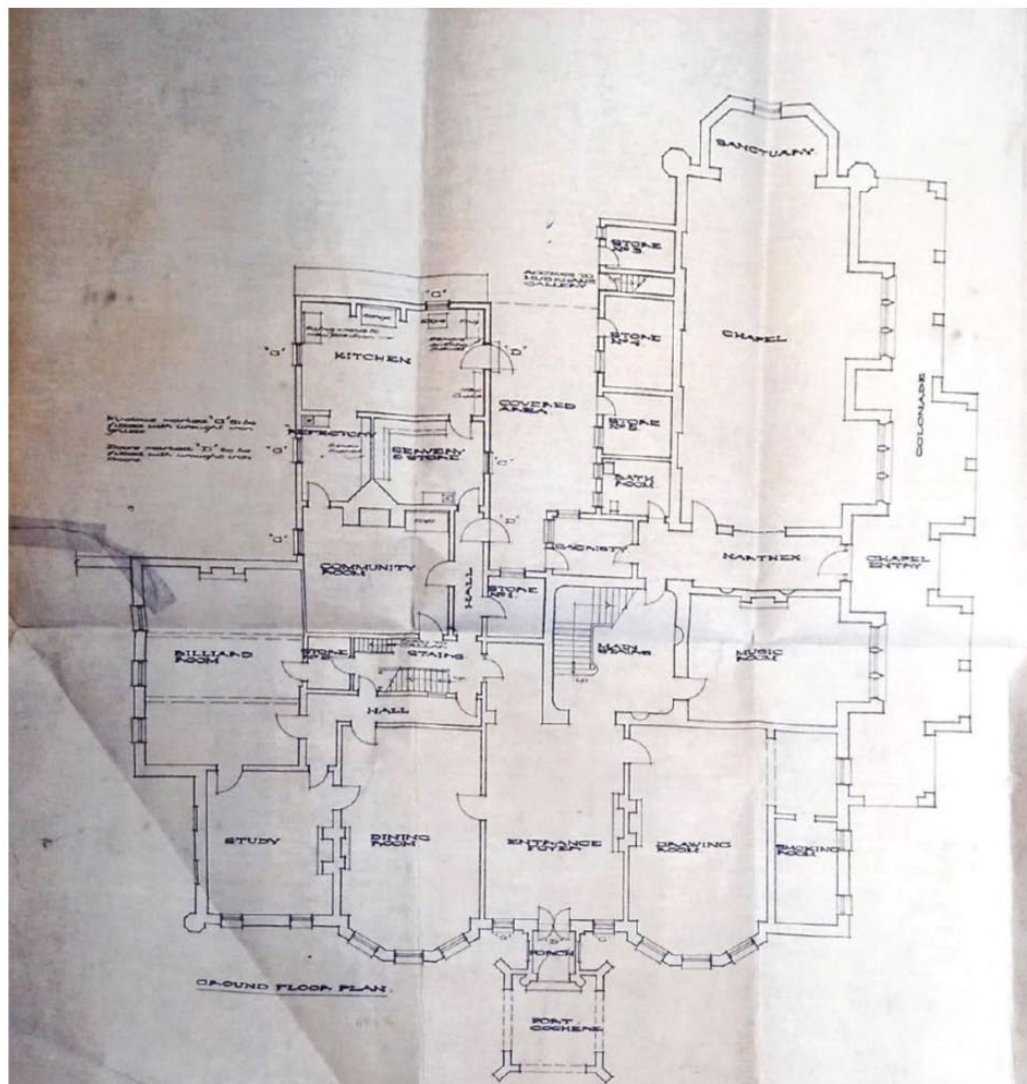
SG Hirst & Kennedy, Architects 1964, Ground floor plan 'Proposed alterations—Swifts, 65 Darling Point Rd, Darling Point for His Eminence NT Cardinal Gilroy Archbishop of Sydney St Marys Cathedral'. (Source: BA753/64, Woollahra Municipal Council)
